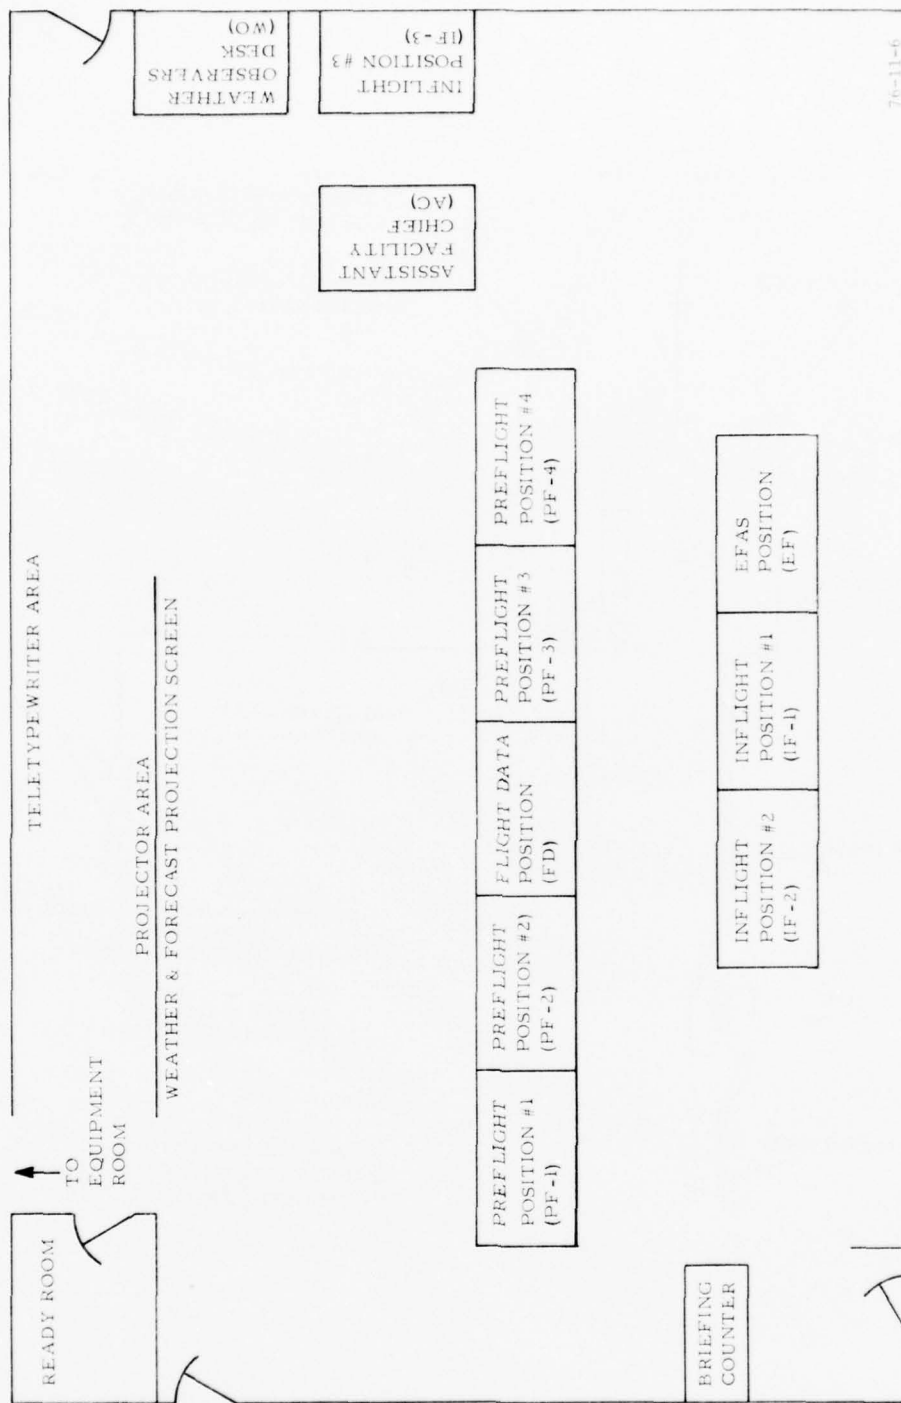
FLOOR PLAN, PORTLAND FSS OPERATIONS ROOM
